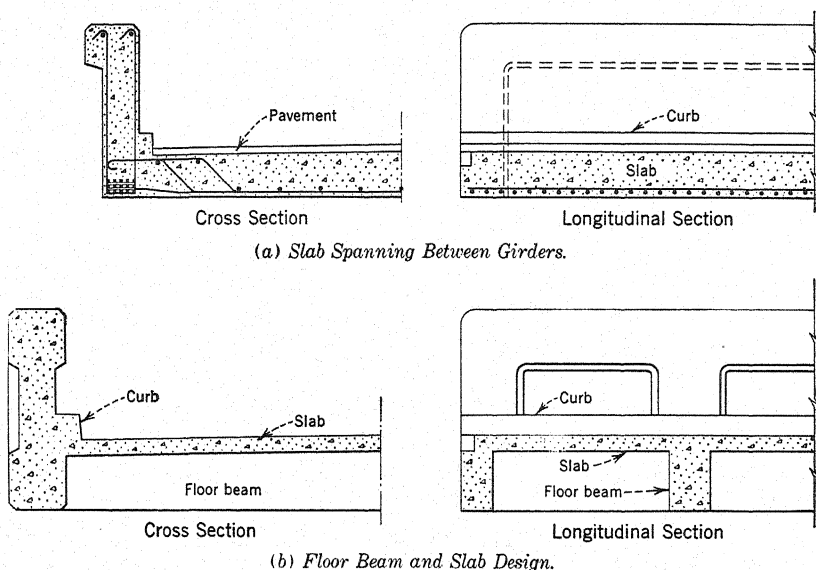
Typical Floor Designs for Through Girder Bridges. (See p. 94.)
